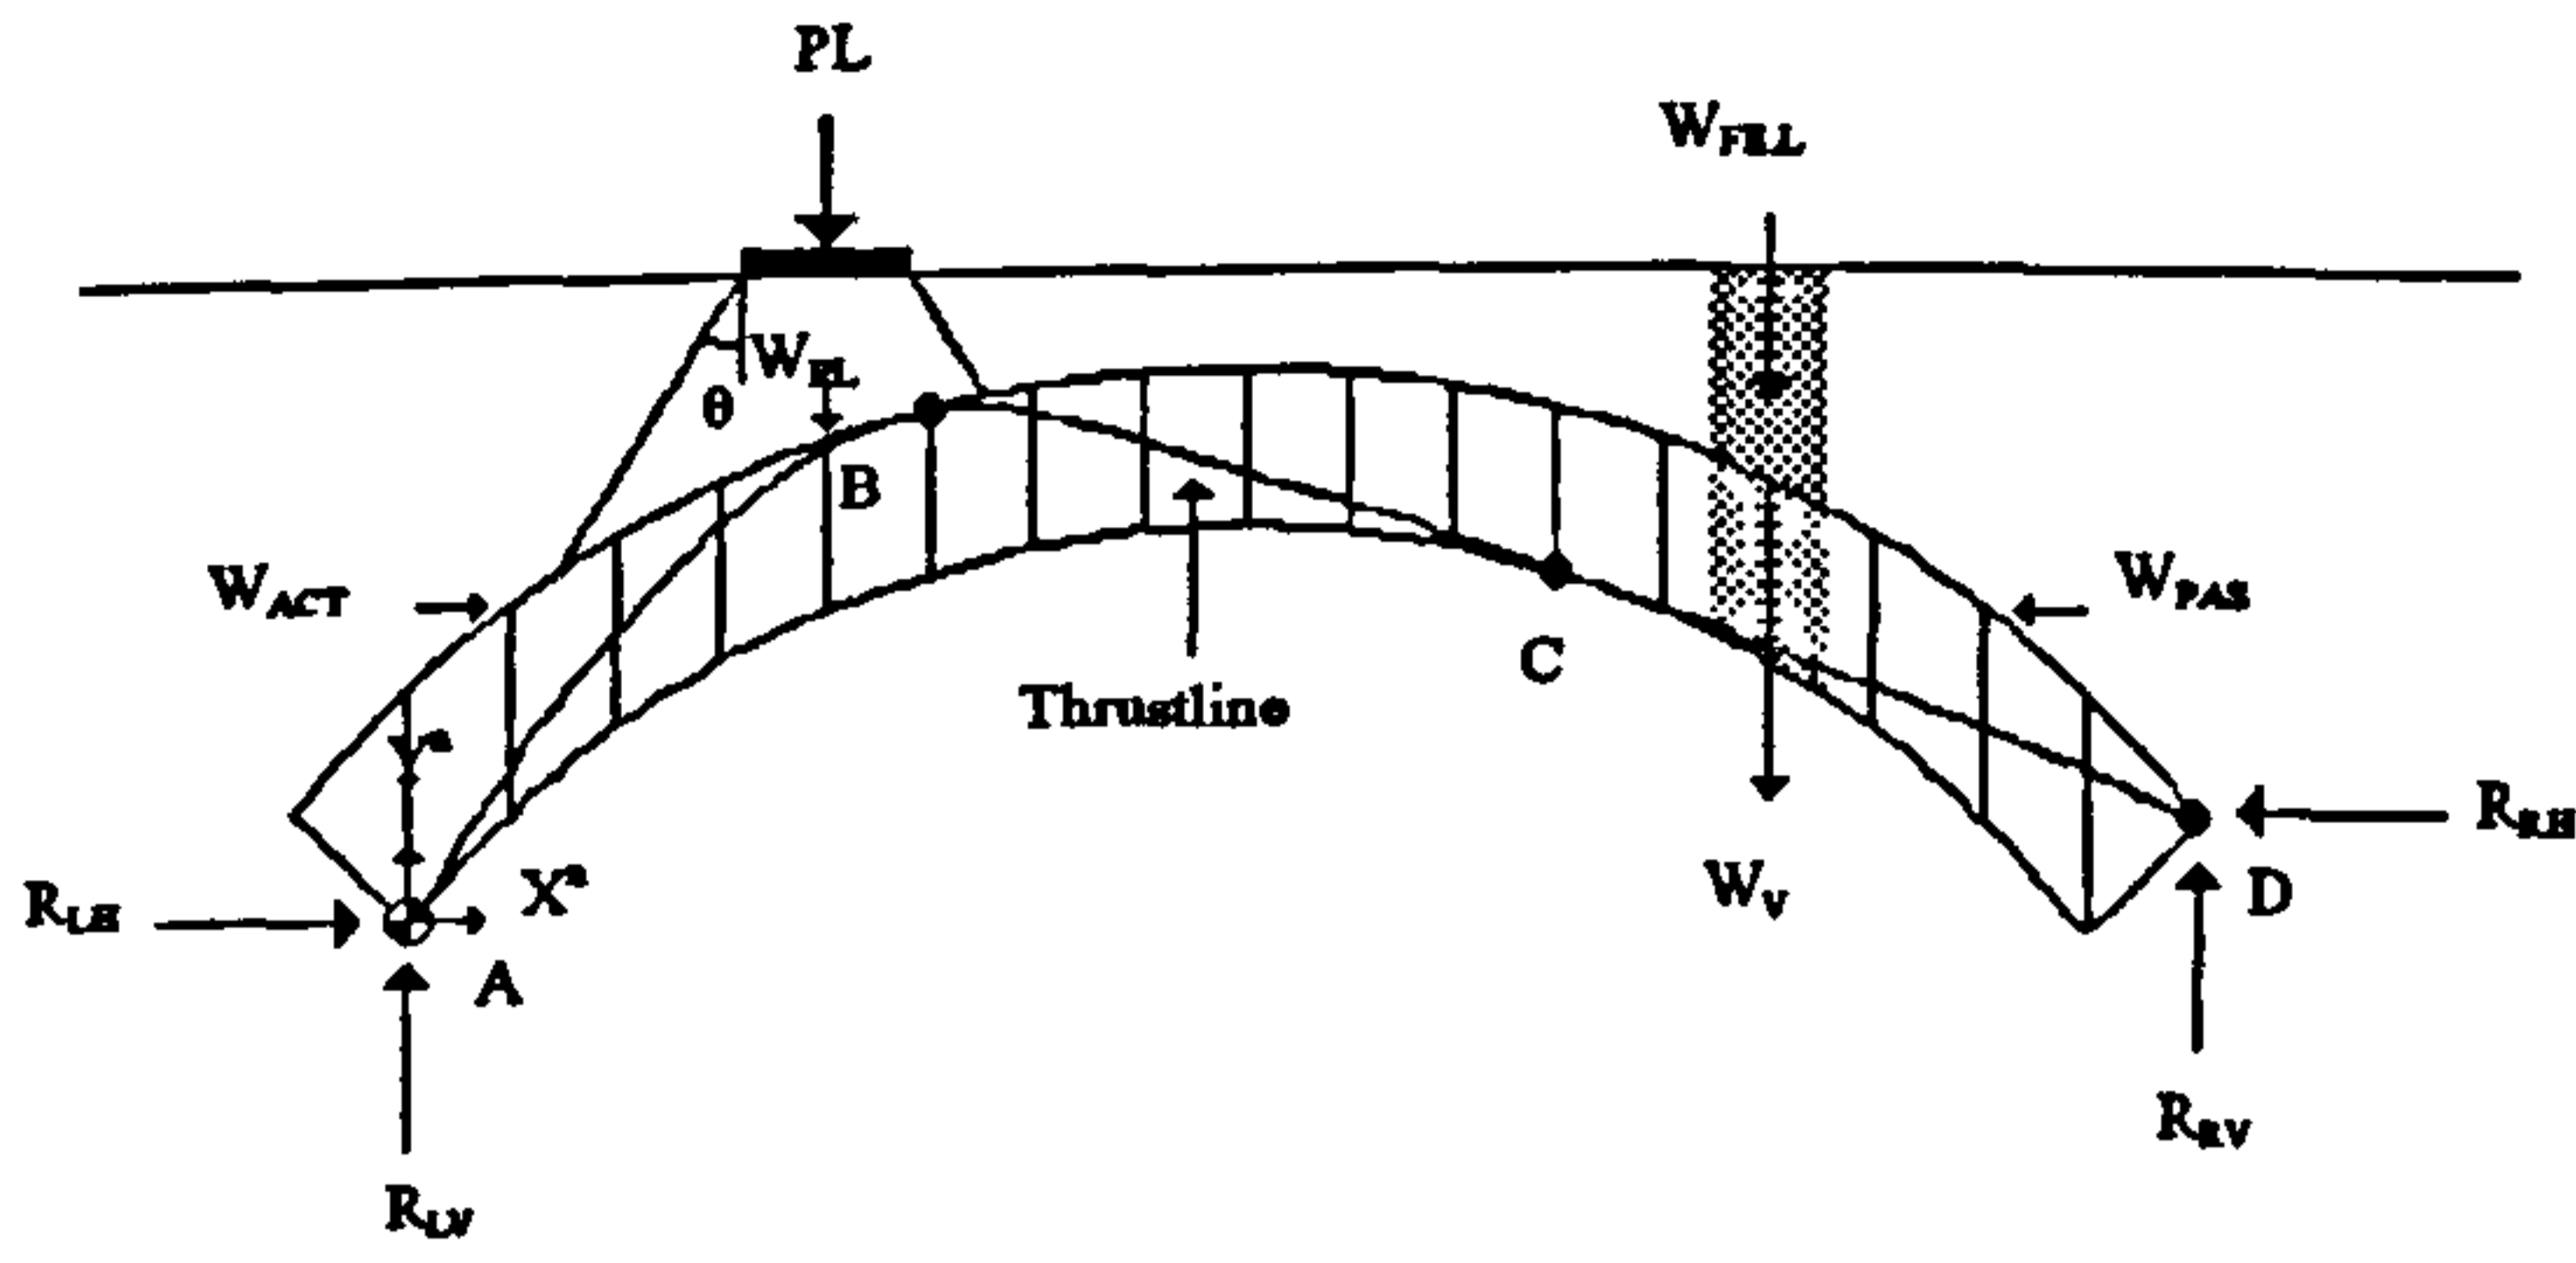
Idealisation of an arch bridge with a typical collapse mechanism under load, PL shown
